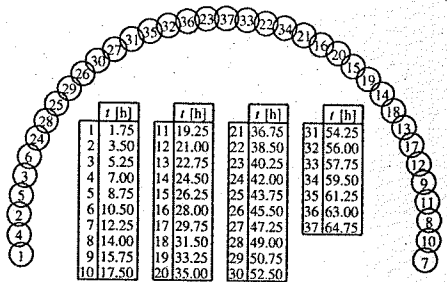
Jet-grouting scheme for the construction of a support structure consisting of 37 jet-grouted columns (t [h] indicates the time instant of the end of construction of the respective column, measured from the begin of construction of column 1).
